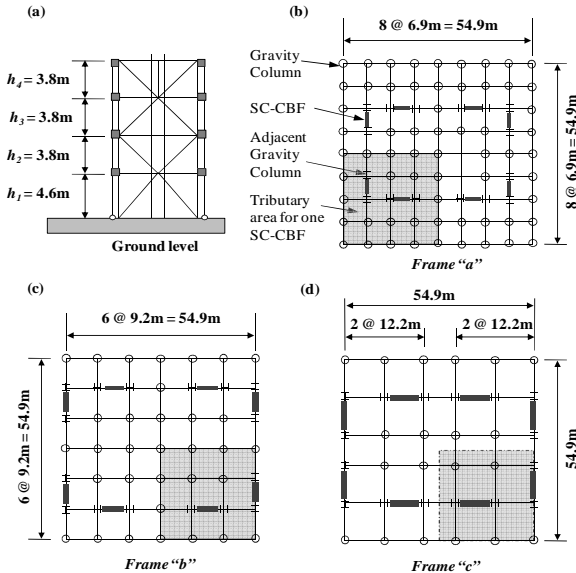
Prototype structures: (a) typical elevation; (b) floor plan for Frame "a"; (c) floor plan for Frame "b"; (d) floor plan for Frame "c".
